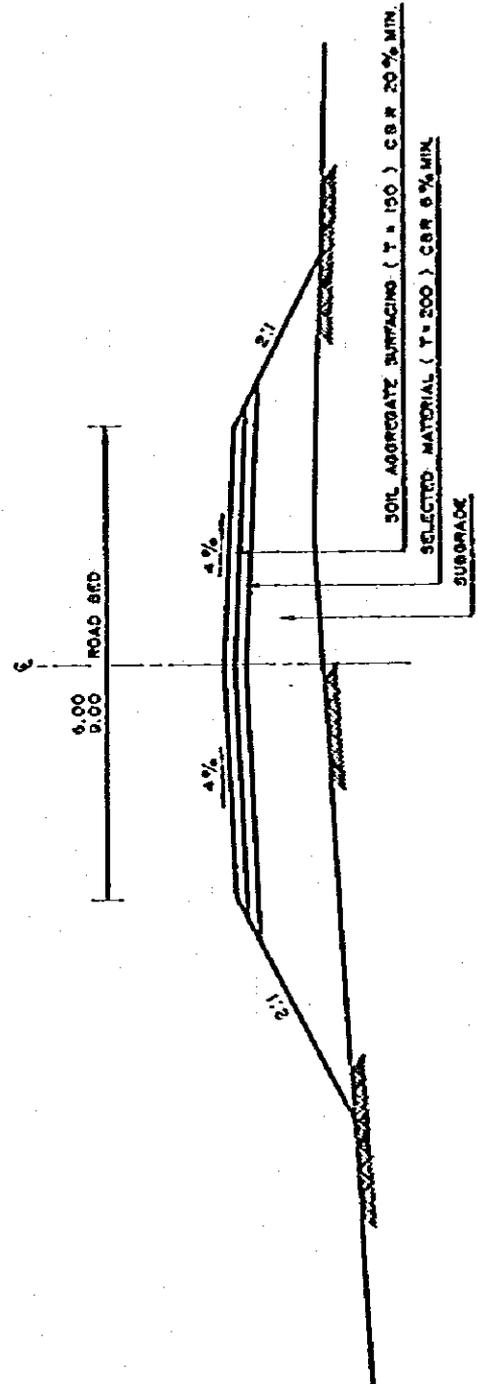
TYPICAL PAVEMENT STRUCTURE
